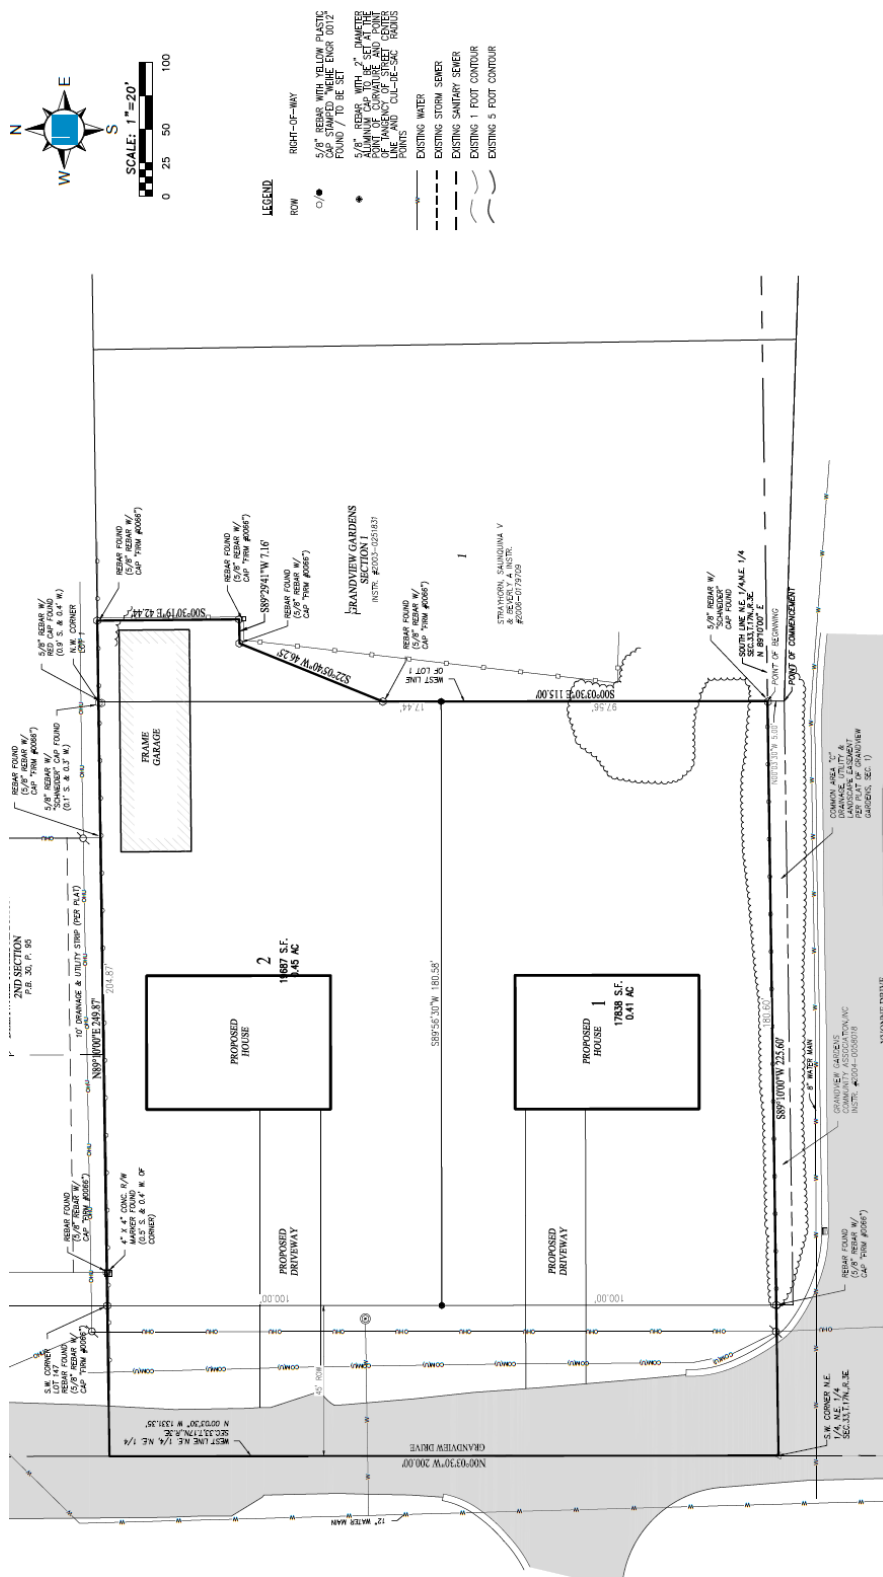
Proposed single-family structures to be built on the newly created parcels if approved.
